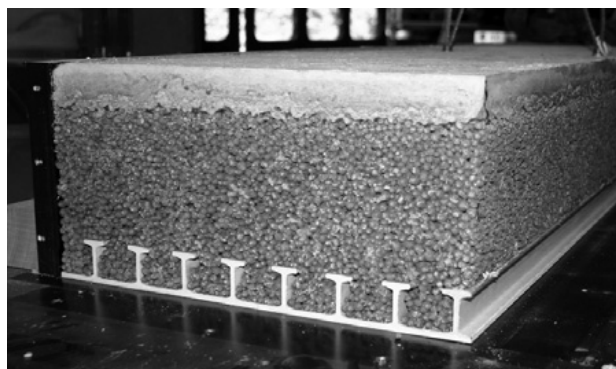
Sandwich element of pultruded FRP profile, lightweight concrete as core and UHPFRC concrete as compression skin. [Keller et al., 2006]
